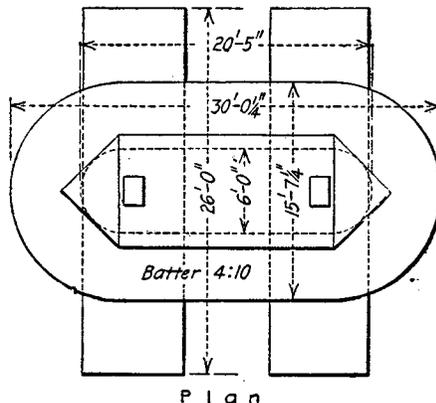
DETAILS OF PIER 7, TYPICAL OF SOLID-BOTTOM PIERS
